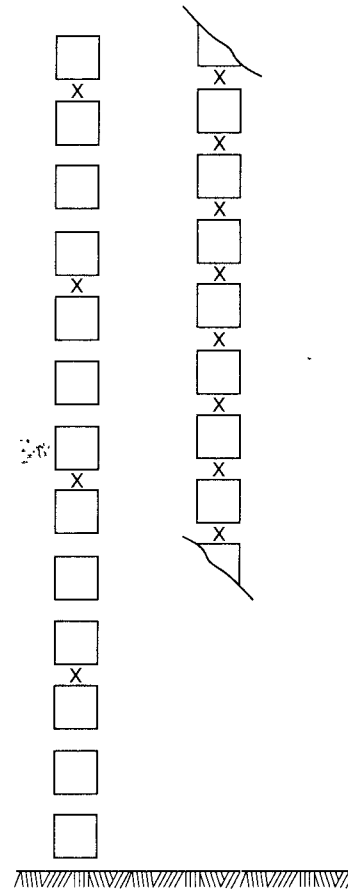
(b) In-rack sprinkler arrangement, Group A plastic commodities, storage height over 25 ft (7.6 m).
